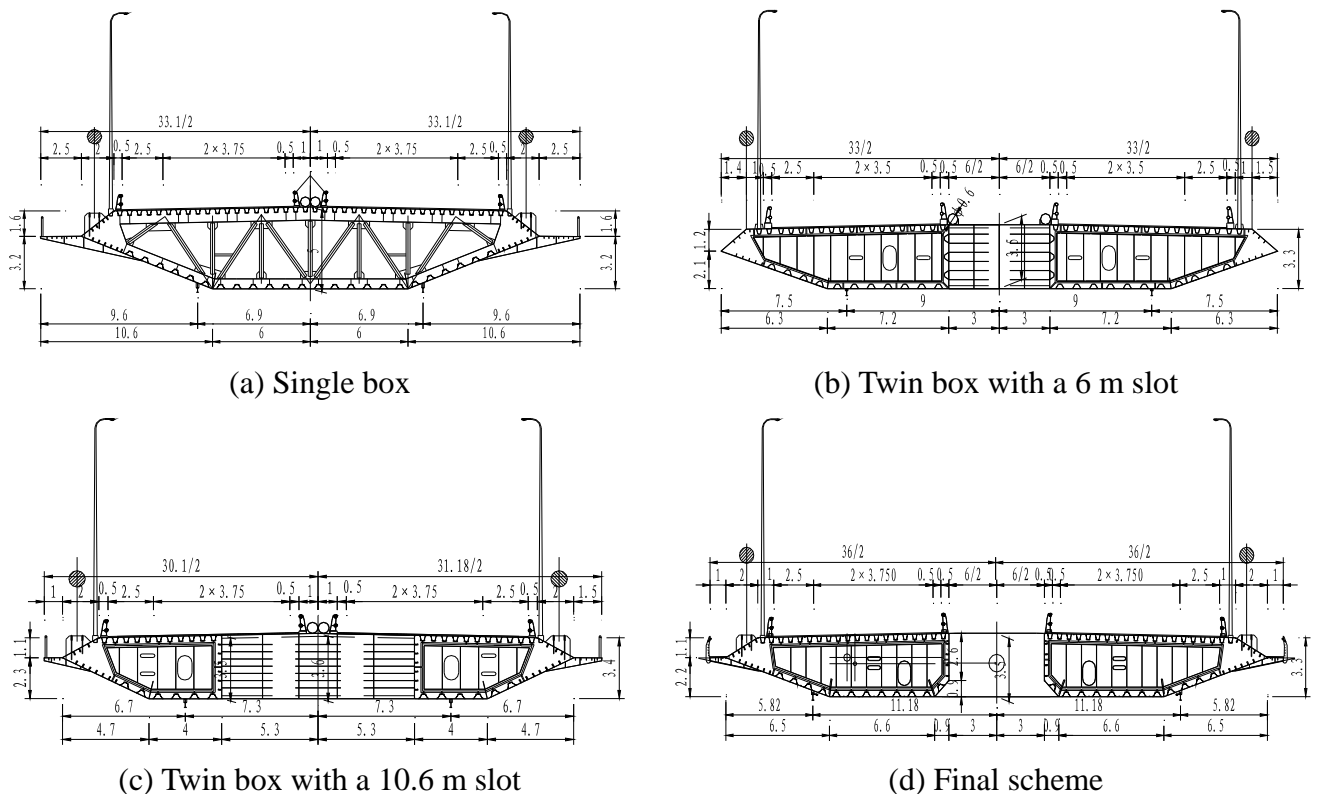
Proposed box girder sections for the Zhejiang Xihoumen Bridge (Dimensions m)
